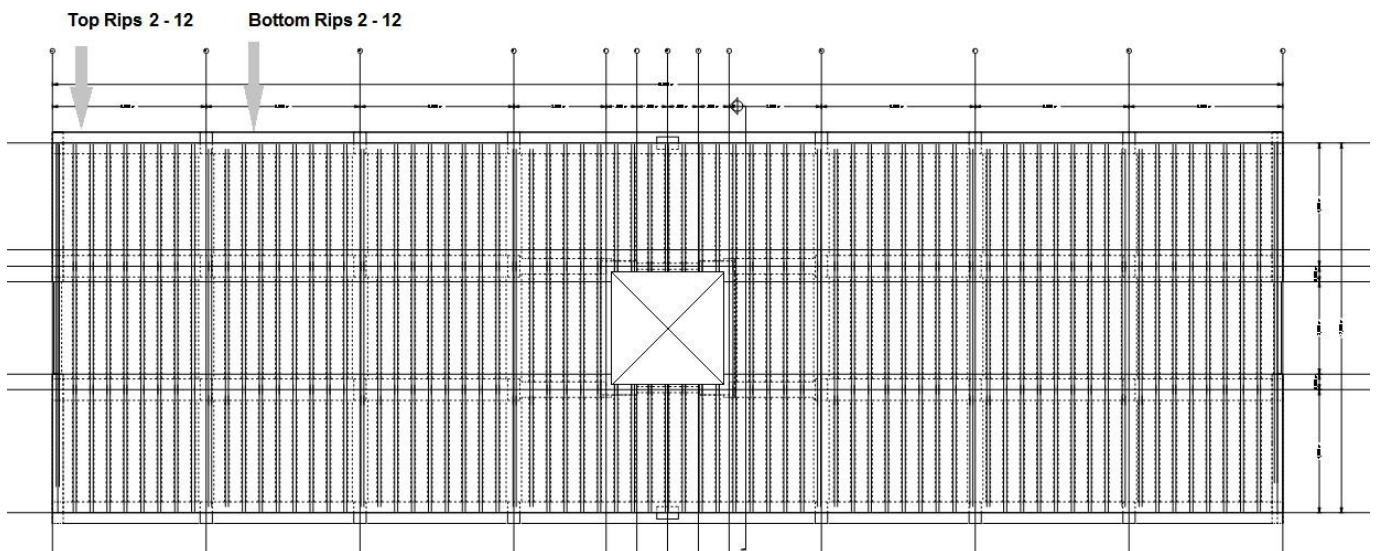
Reinforcement Detailing for Ribbed Slab
